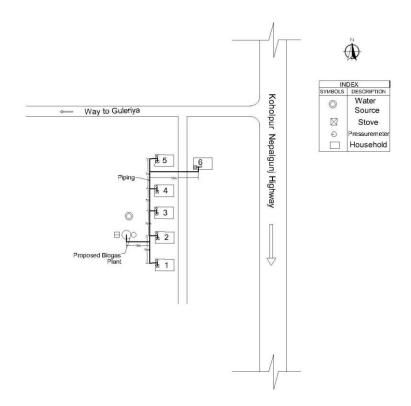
Plan drawing of the Jahirpur Community biogas plant with piping system.
